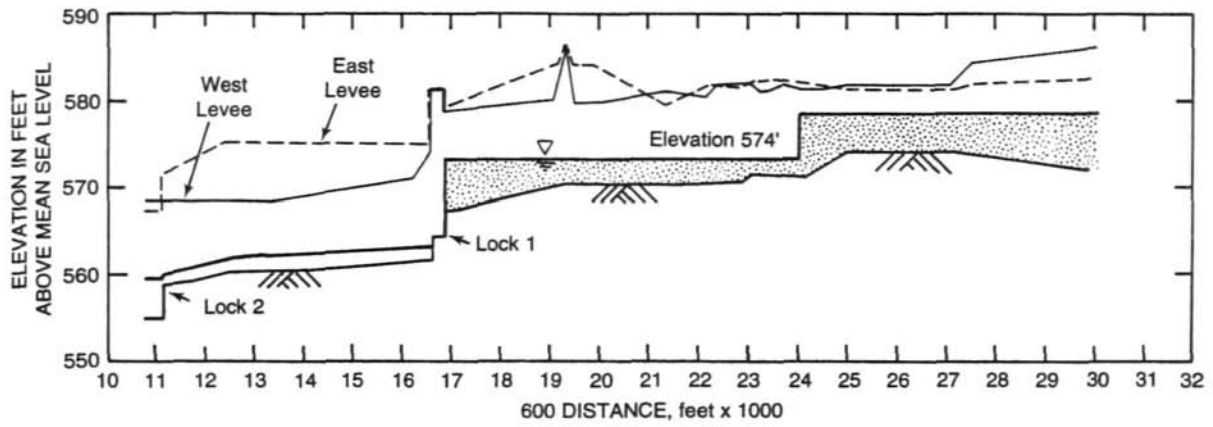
Proposed water elevations from Lock 1 to the Texaco Dam
